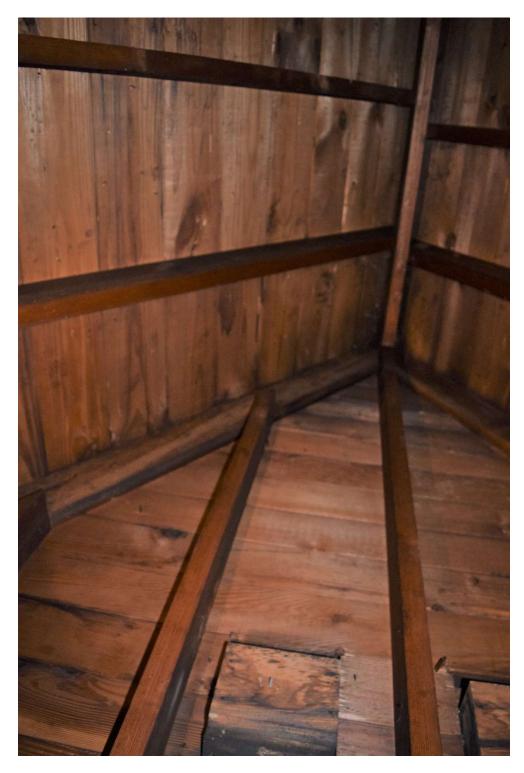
North Wing Attic (looking towards South) Looking towards South.
